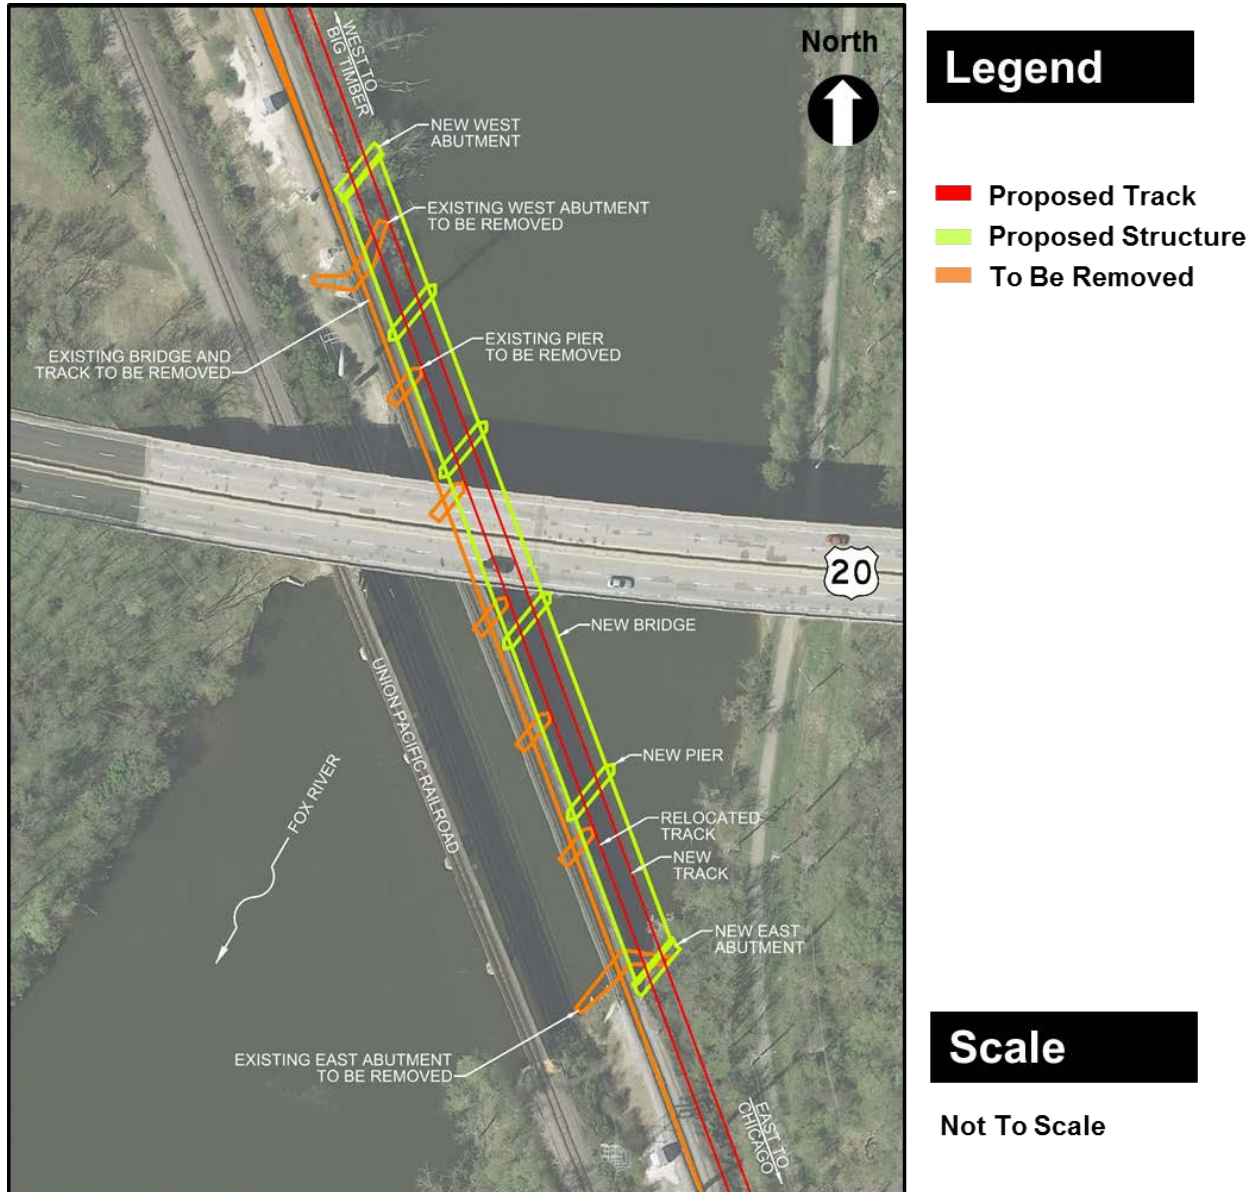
A: Components of Alternative 1A – Construct a New Double Track Bridge on New Alignment East (Upstream)
